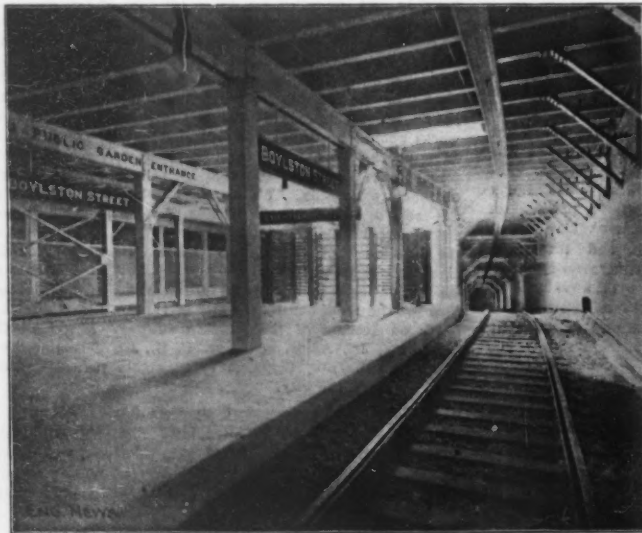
BOYLSTON ST. STATION LOOKING SOUTH TOWARD INCLINE TO SUB-SUBWAY.
